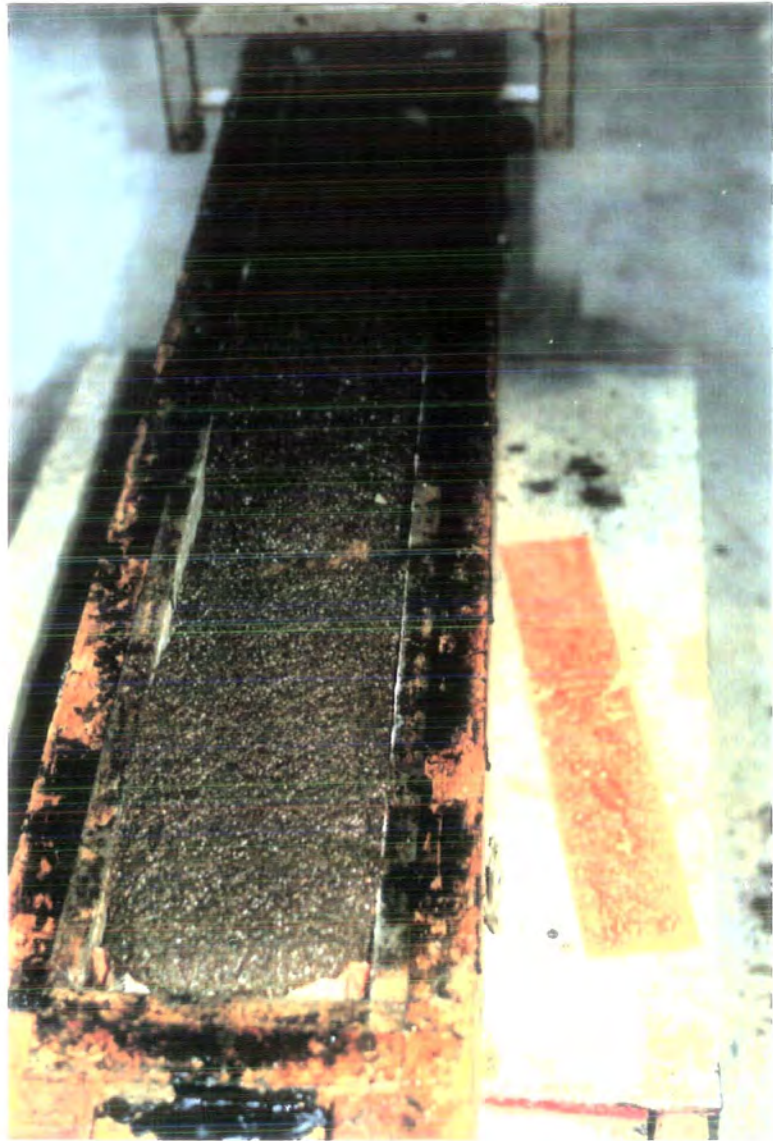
Casting the final batch of the Phenolic Concrete mix over the positioned core and the longitudinal steel bars.
